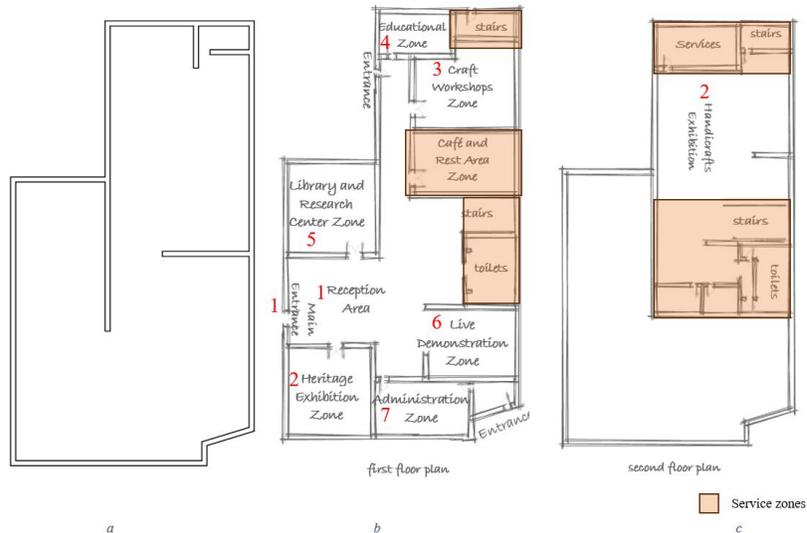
Plans of Proposal of Tarabish Factory as a cultural center for handicrafts. a. current condition of Tarabish Factory. b. Proposed plan of the first floor. C. Proposed plan of the second floor Source: Authors.
